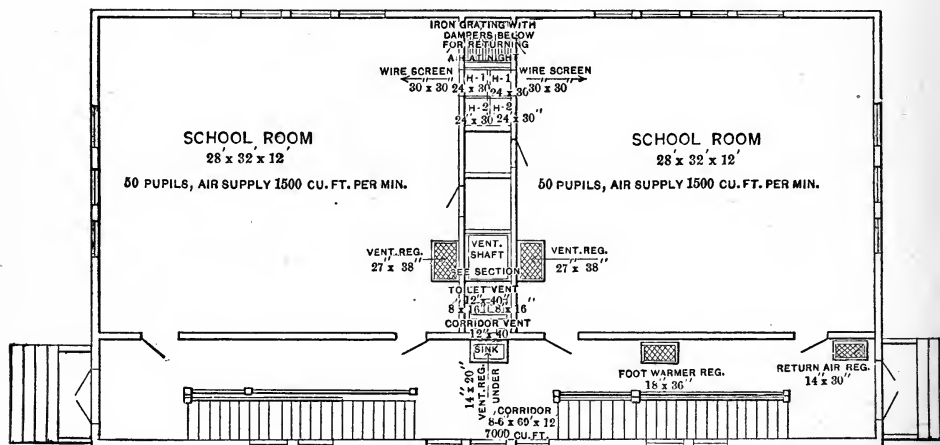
First-Floor Plan (12' 0") of School Building Heated by a Furnace System.
